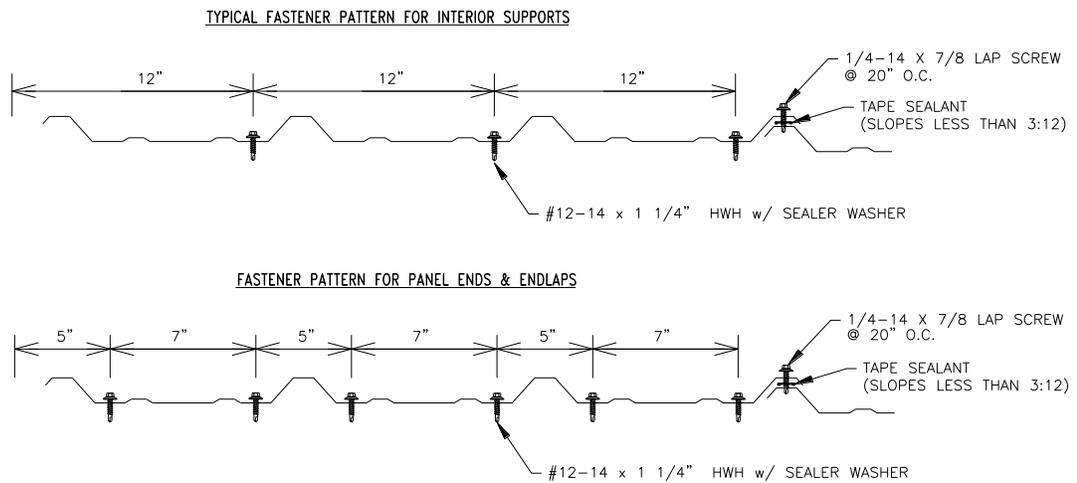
Minimum 26 Gauge PBR Panel Fastener Patterns
